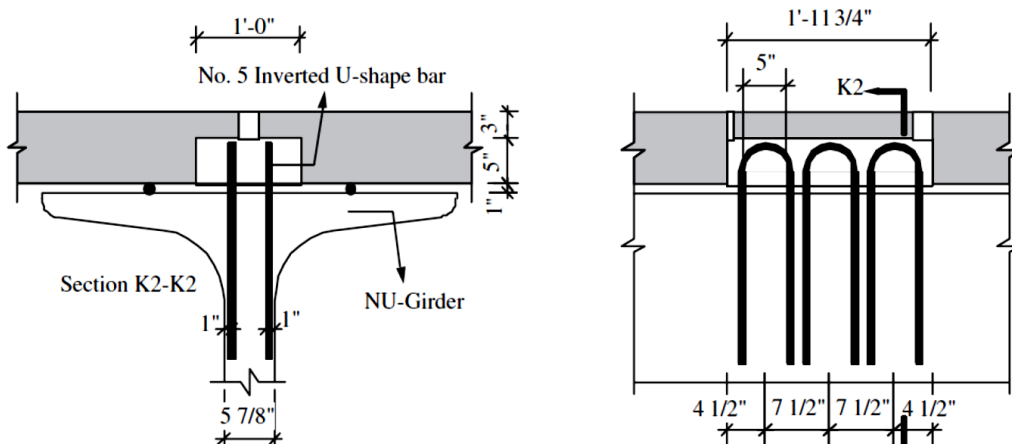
Inverted U-shape Horizontal Shear Reinforcement Placed Longitudinally (Badie and Tadros, 2008)
